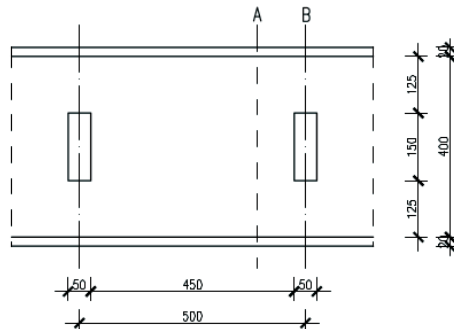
The cross-section of a wall made of a mix formed in the formwork
